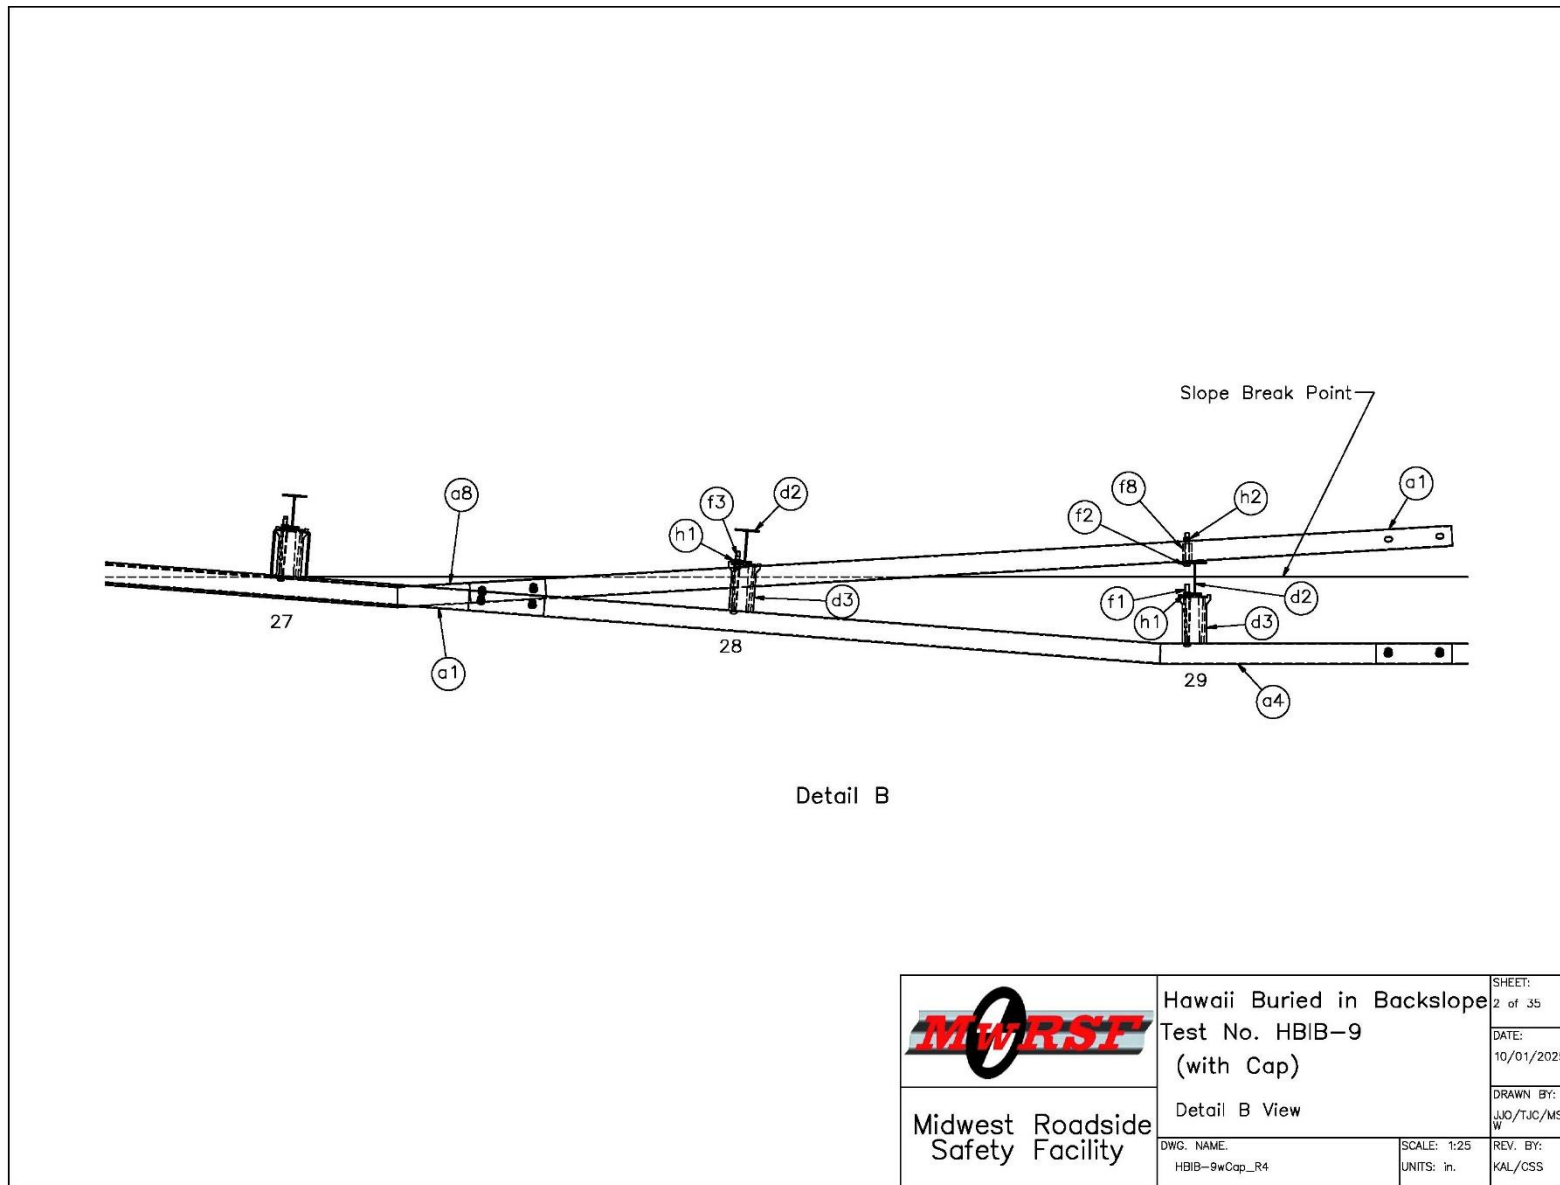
Rubrail Termination Details, Deviation Point, Test No. HBIB-9
